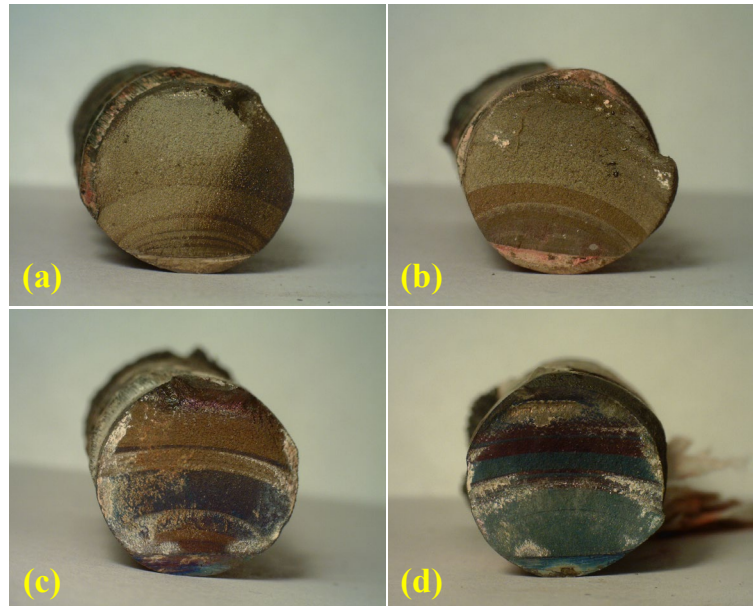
Fractographic profile for (a) rebar 3 beam 6, (b) rebar 1 beam 6, (c), rebar 1 beam 7, and (d) rebar 1 beam 8
